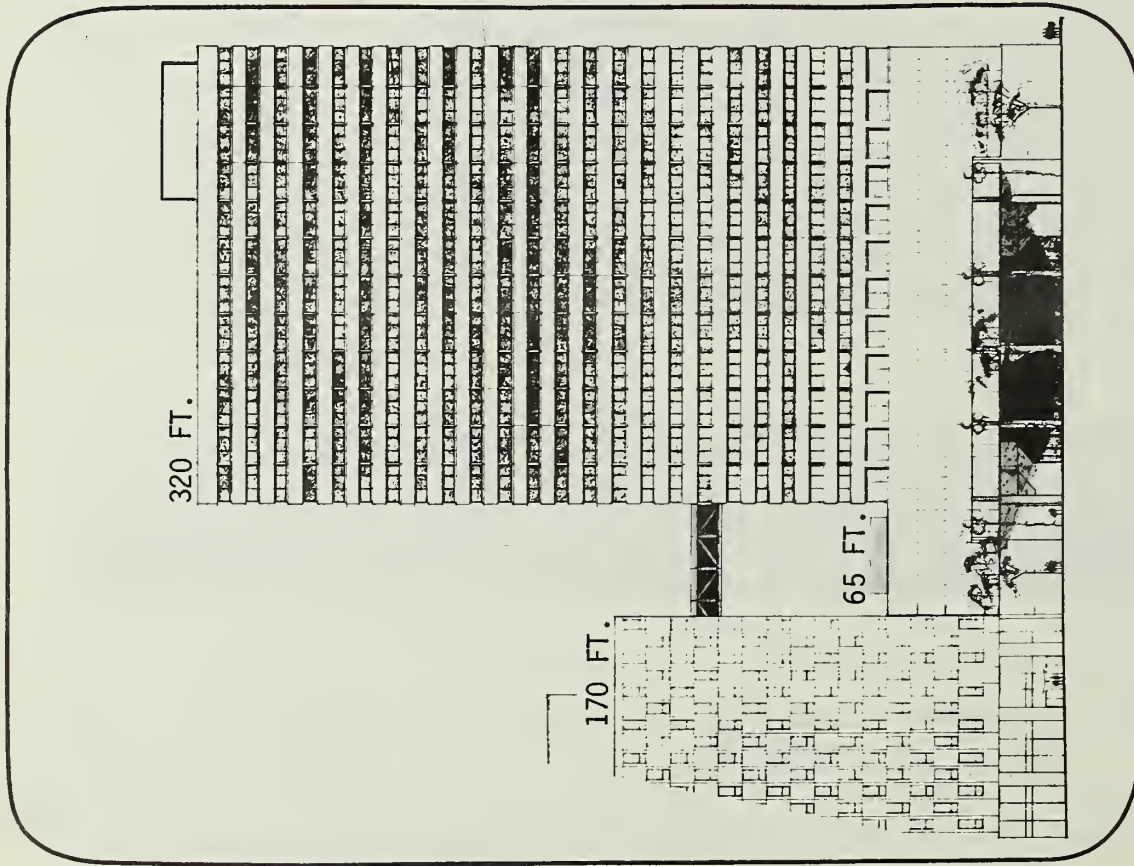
NORTH AND WEST ELEVATIONS OF THE PROPOSED PROJECT
